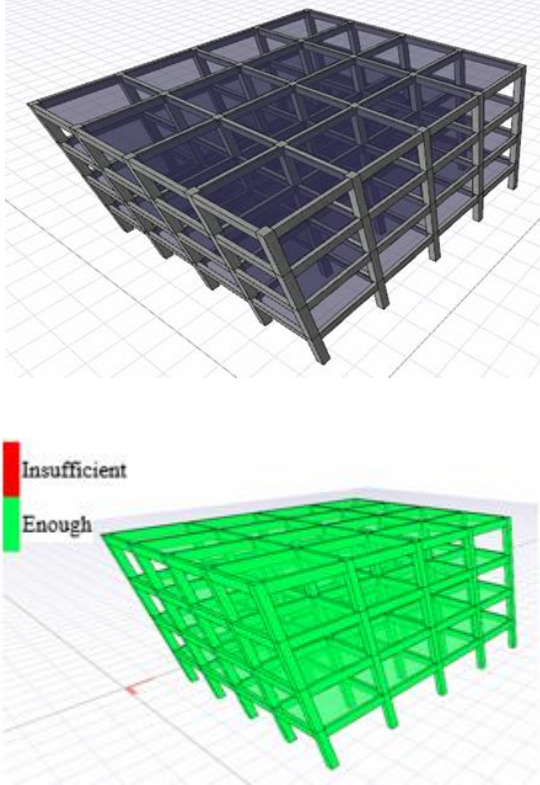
Elevation and Structural Design of the 4-Story Reinforced Concrete Building
